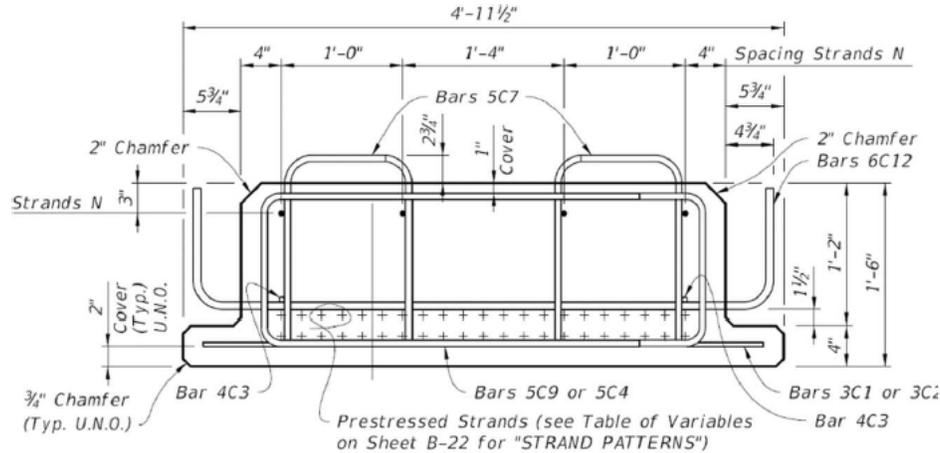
13 Typical Florida Slab Beam (FSB) Section [5].
